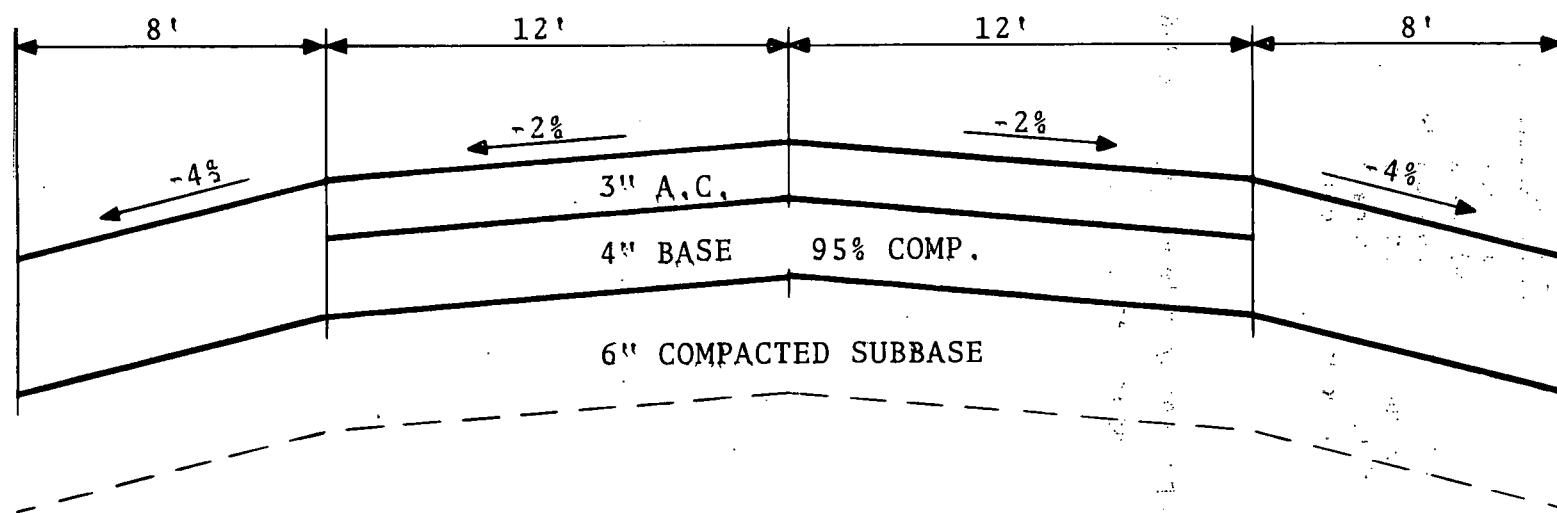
Typical section for WIPP on-site roads
